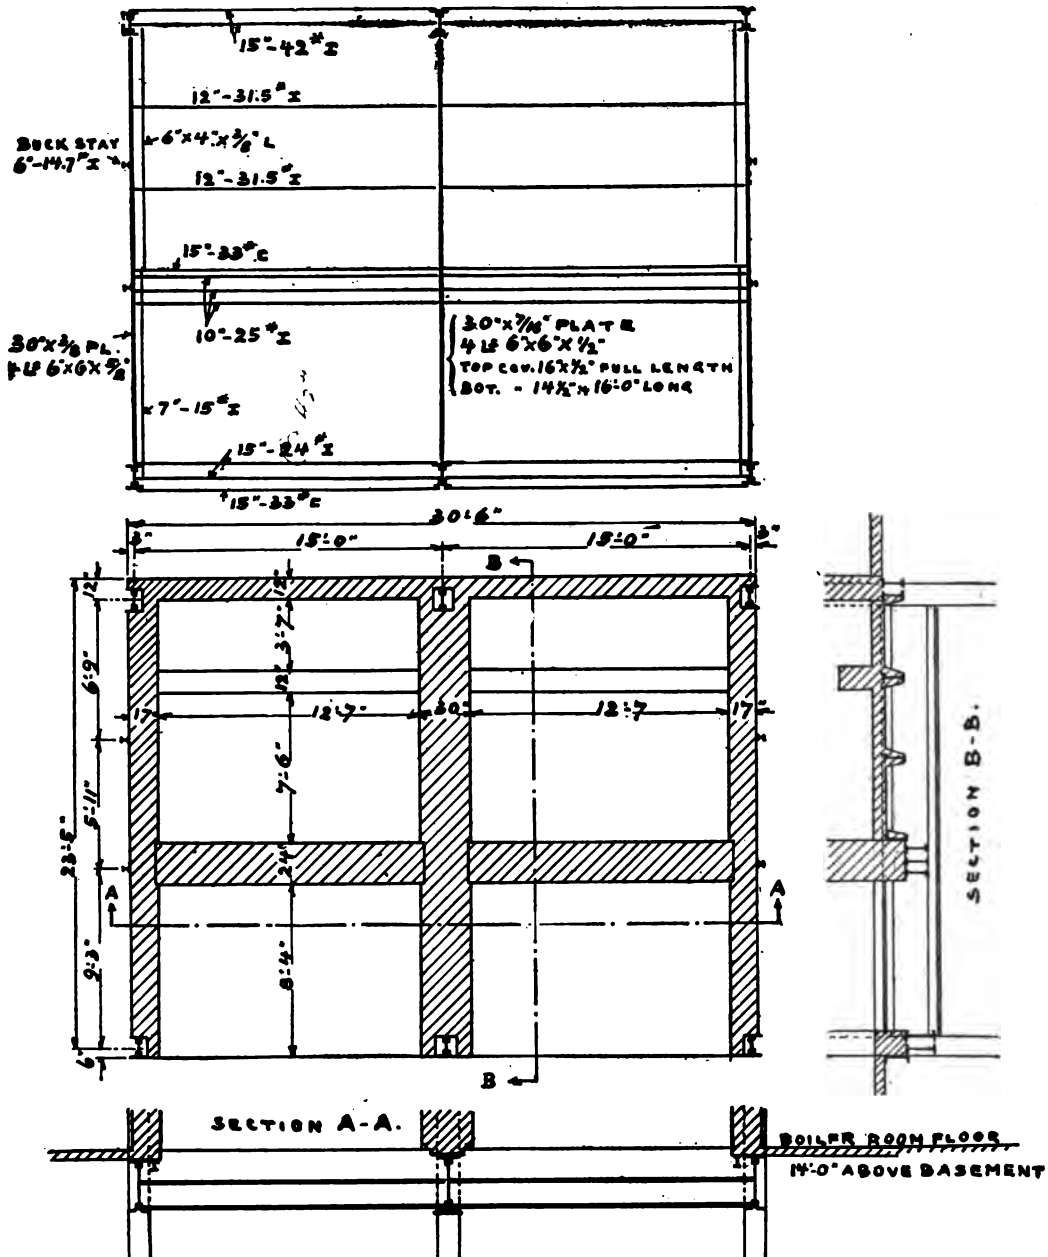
Steel Work and Boiler Setting of two 604 H.P. Babcock and Wilcox Boilers.
